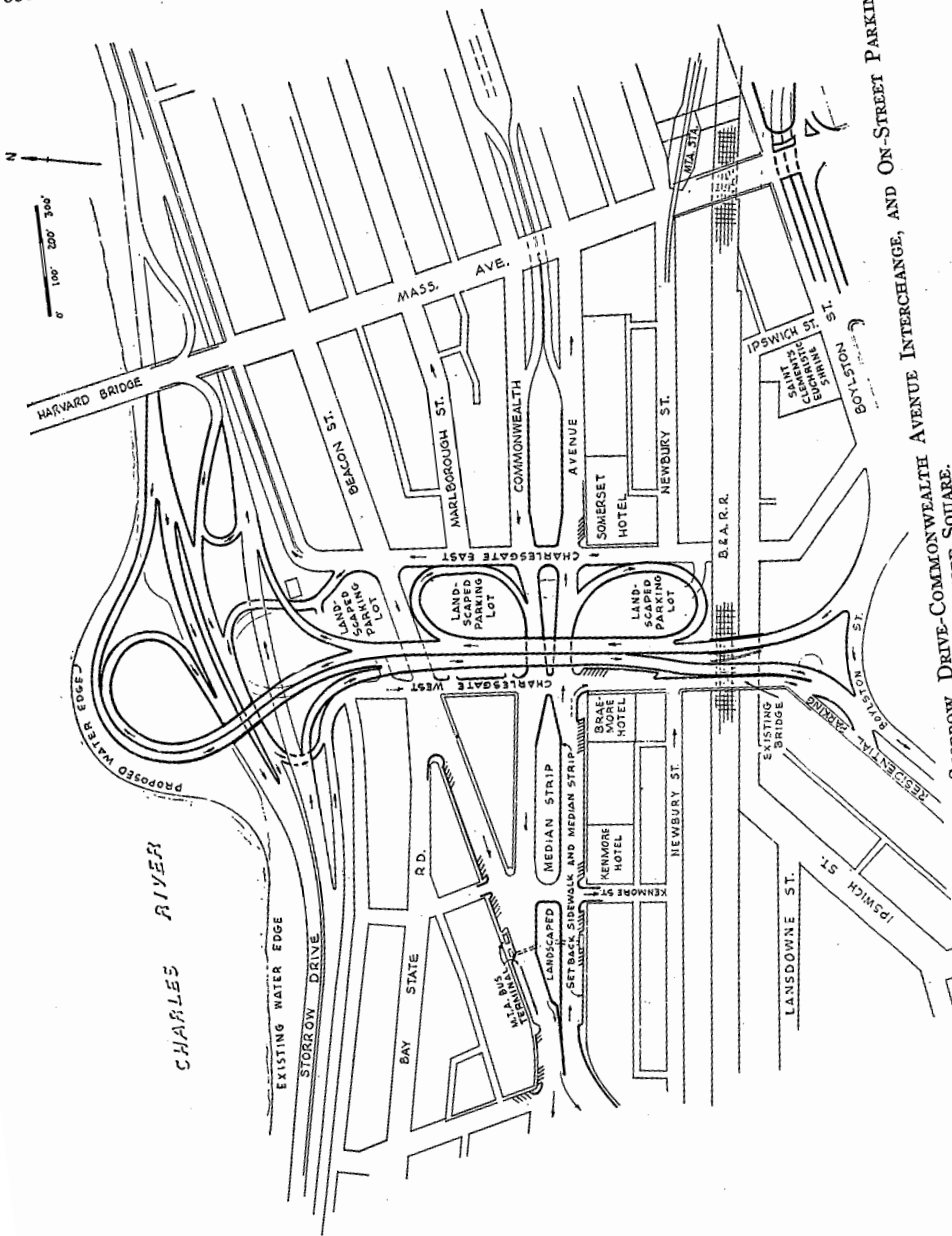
PROPOSED BOYLSTON STREET-STORROW DRIVE-COMMONWEALTH AVENUE INTERCHANGE, AND ON-STREET PARKING AT KENMORE SQUARE.
